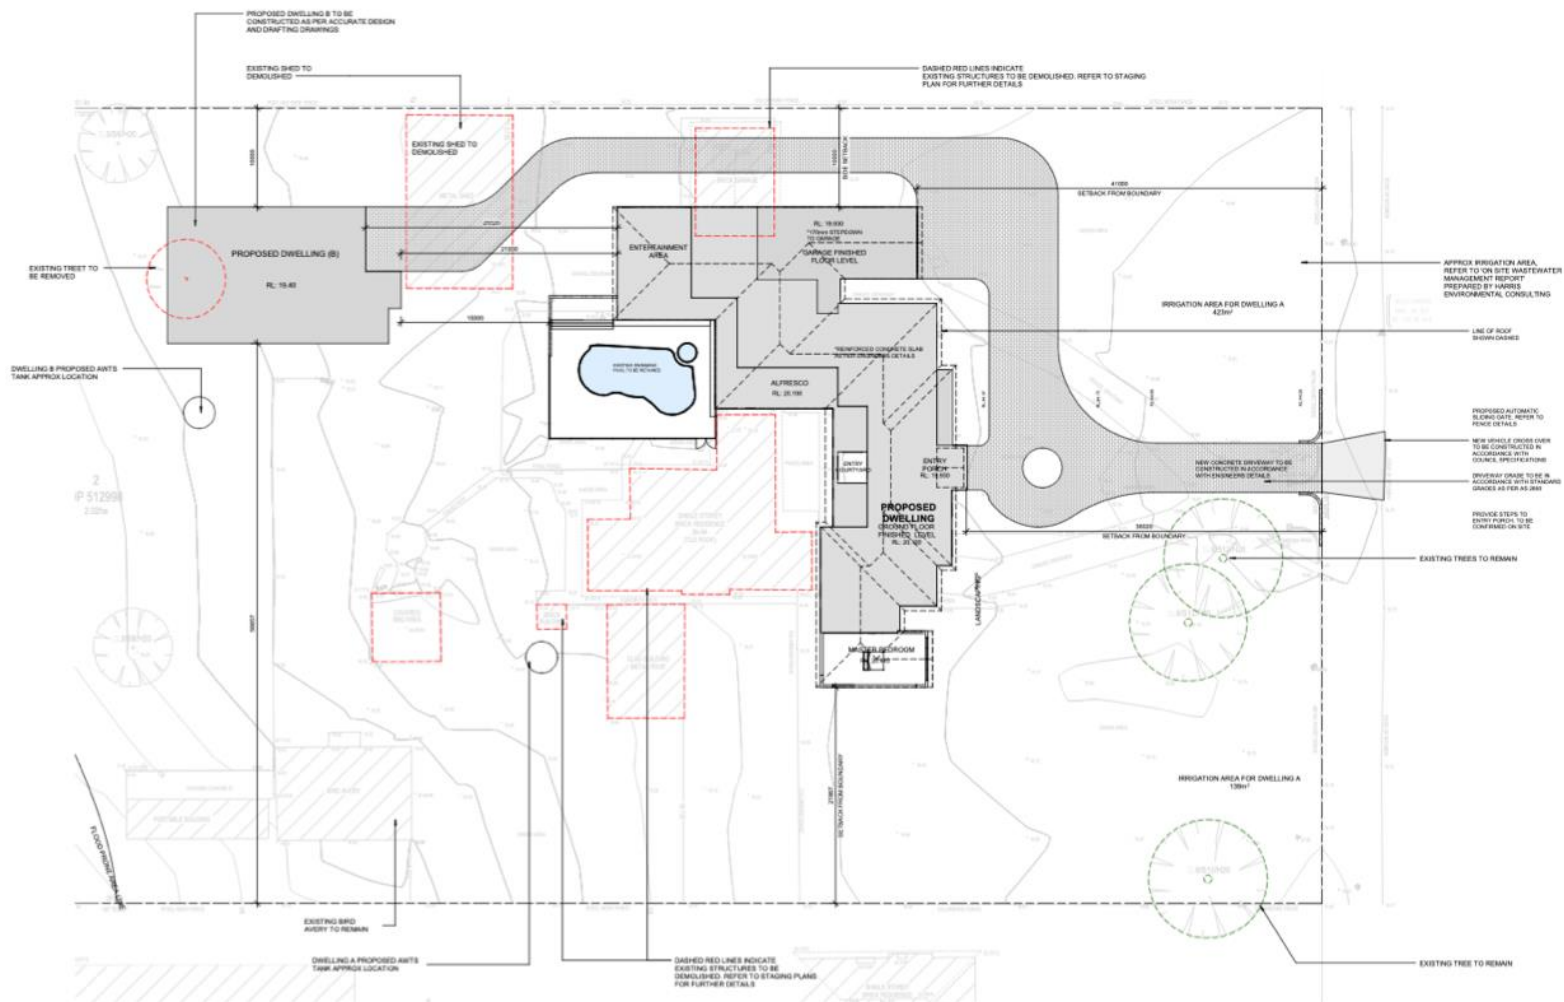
Site Plan for the proposal at 64-70 Clark Road, Londonderry. Source J Mammane Architecture (JMA) 8/02/21 Issue F.
